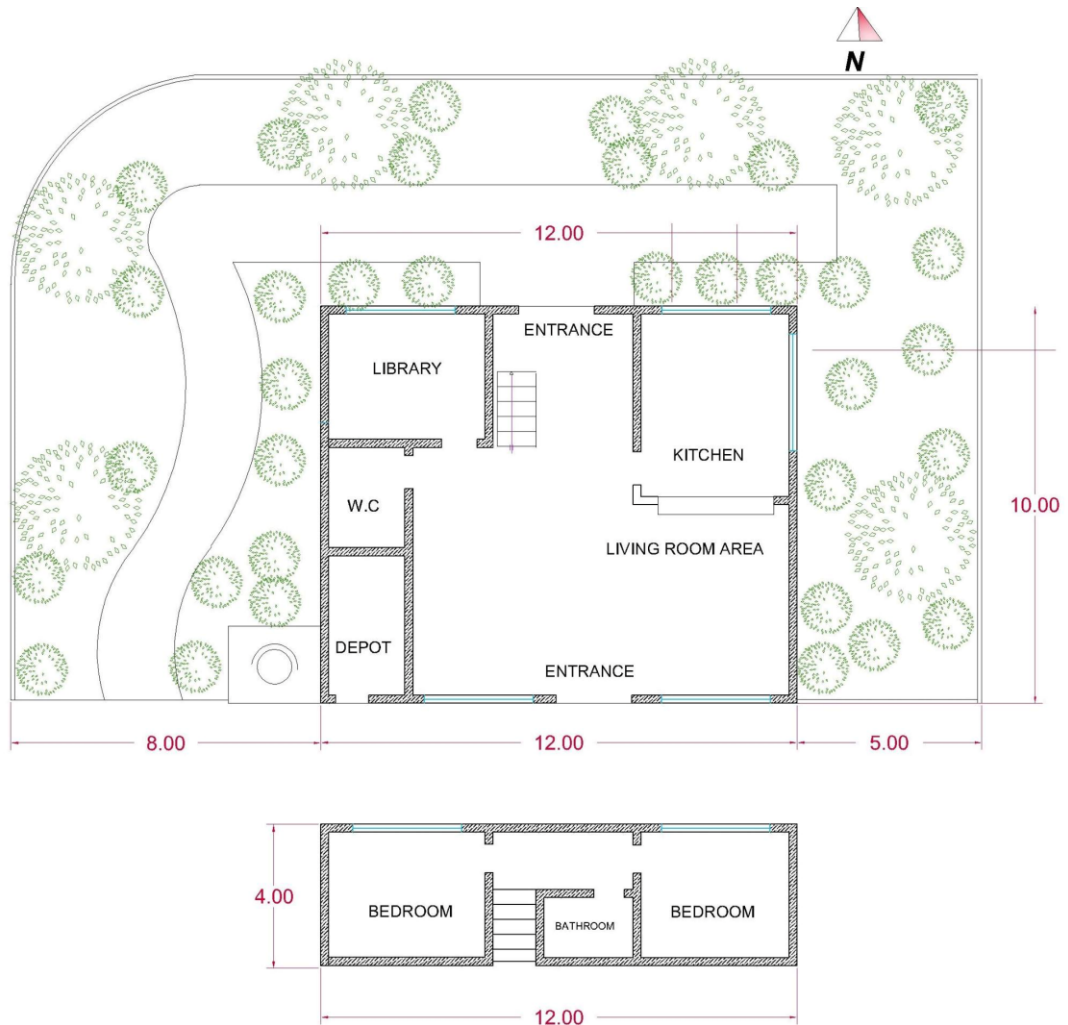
20 Ground floor and basement plan of House 3 (Movahedi, 2014)
